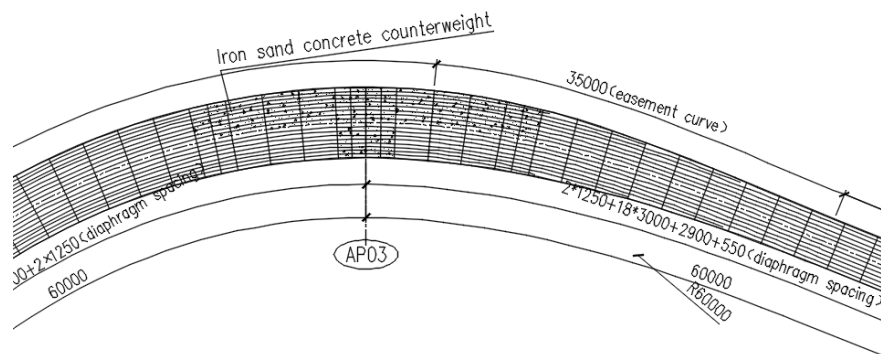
Diagram of the iron sand concrete counterweight zone in the beam (Unit: mm)
